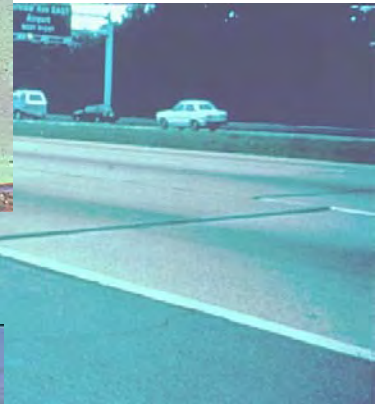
Spalling in concrete pavements [Soares and Zollinger 1998].
